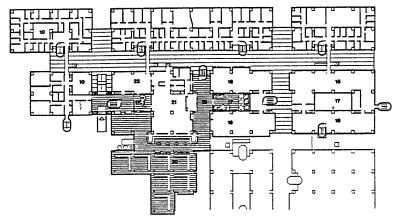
Trondheim University, Norway, Isometric, ground floor plan.
